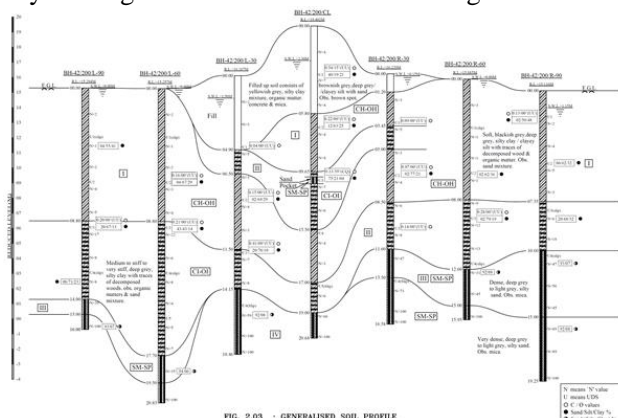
Typical cross sectional soil profile after failure of the embankment.
